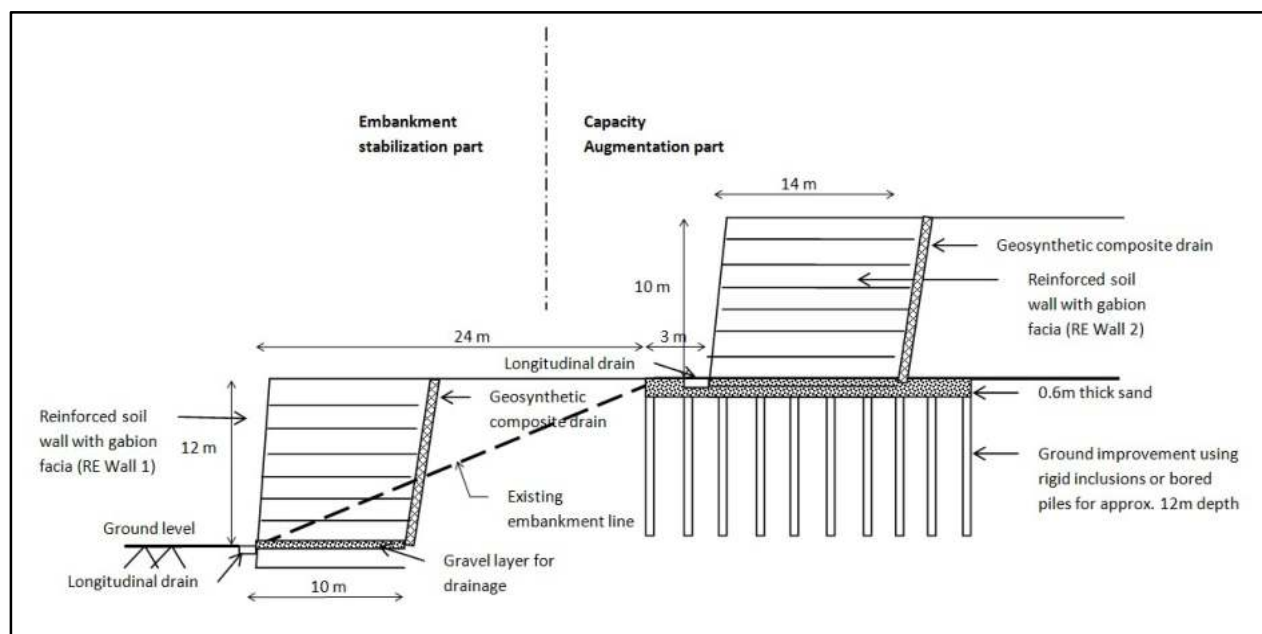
Layout of proposed structures for slope protection and capacity augmentation
